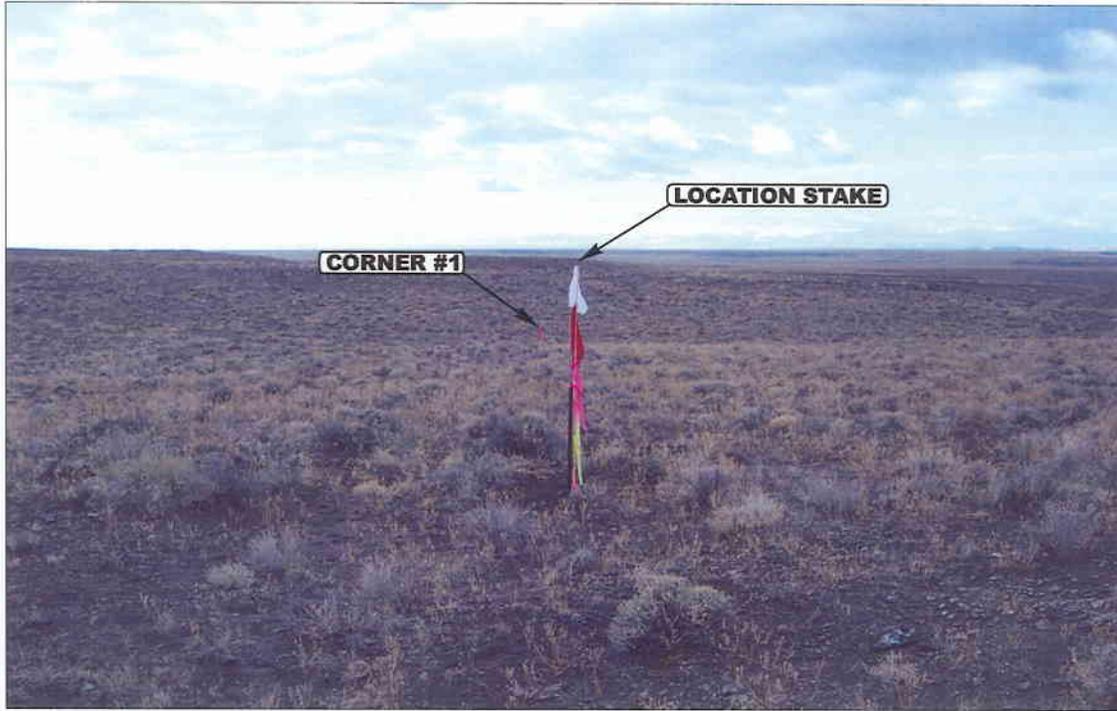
PHOTO: VIEW FROM LOCATION STAKE TO CORNER #1
